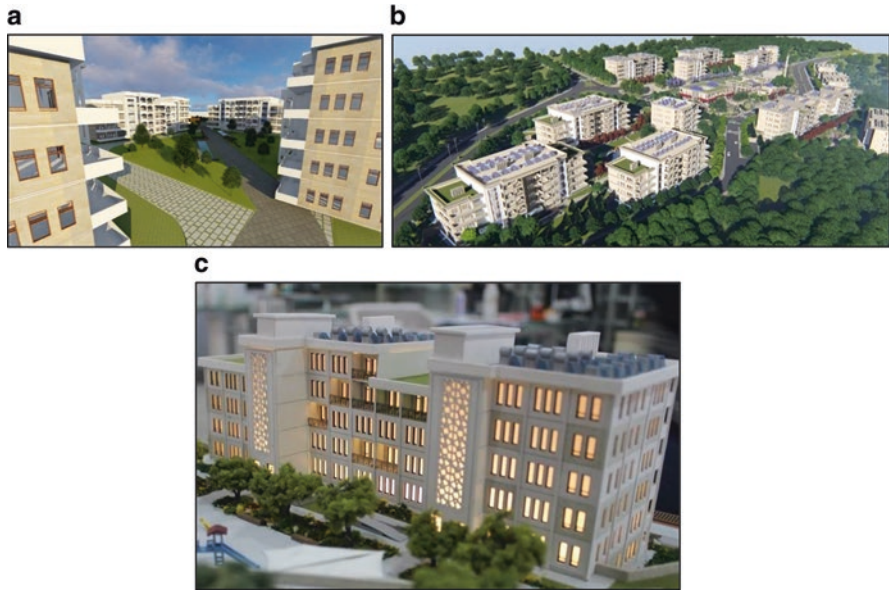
(a) Courtyard and water element (pool) use between apartment blocks. (b) Courtyard design between apartment blocks. (c) Apartment view from courtyard
